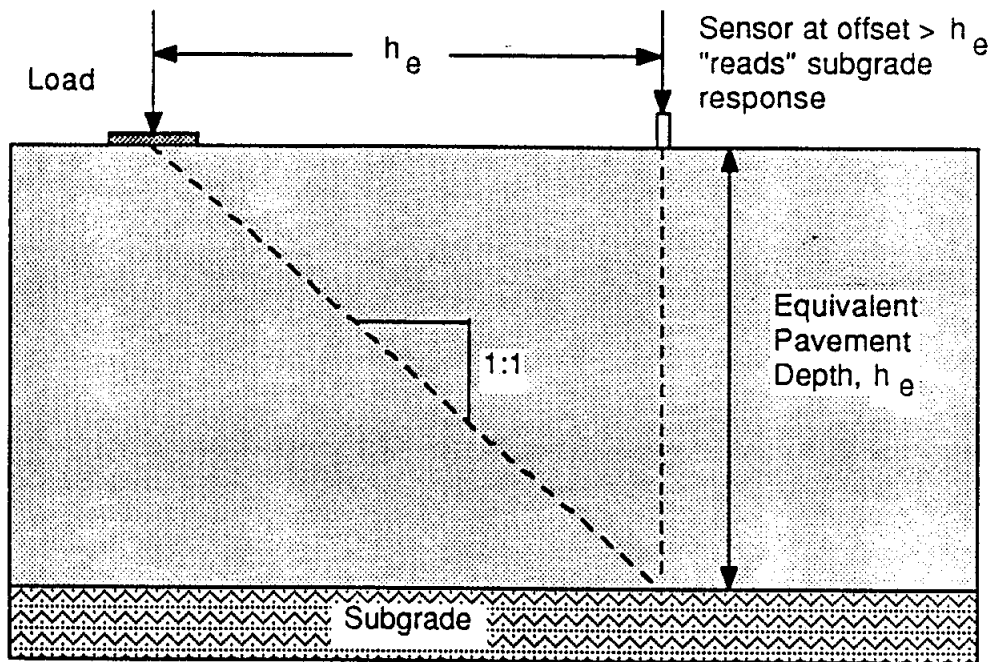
Location of Outer Sensor Beyond Equivalent Depth of Pavement Section.
